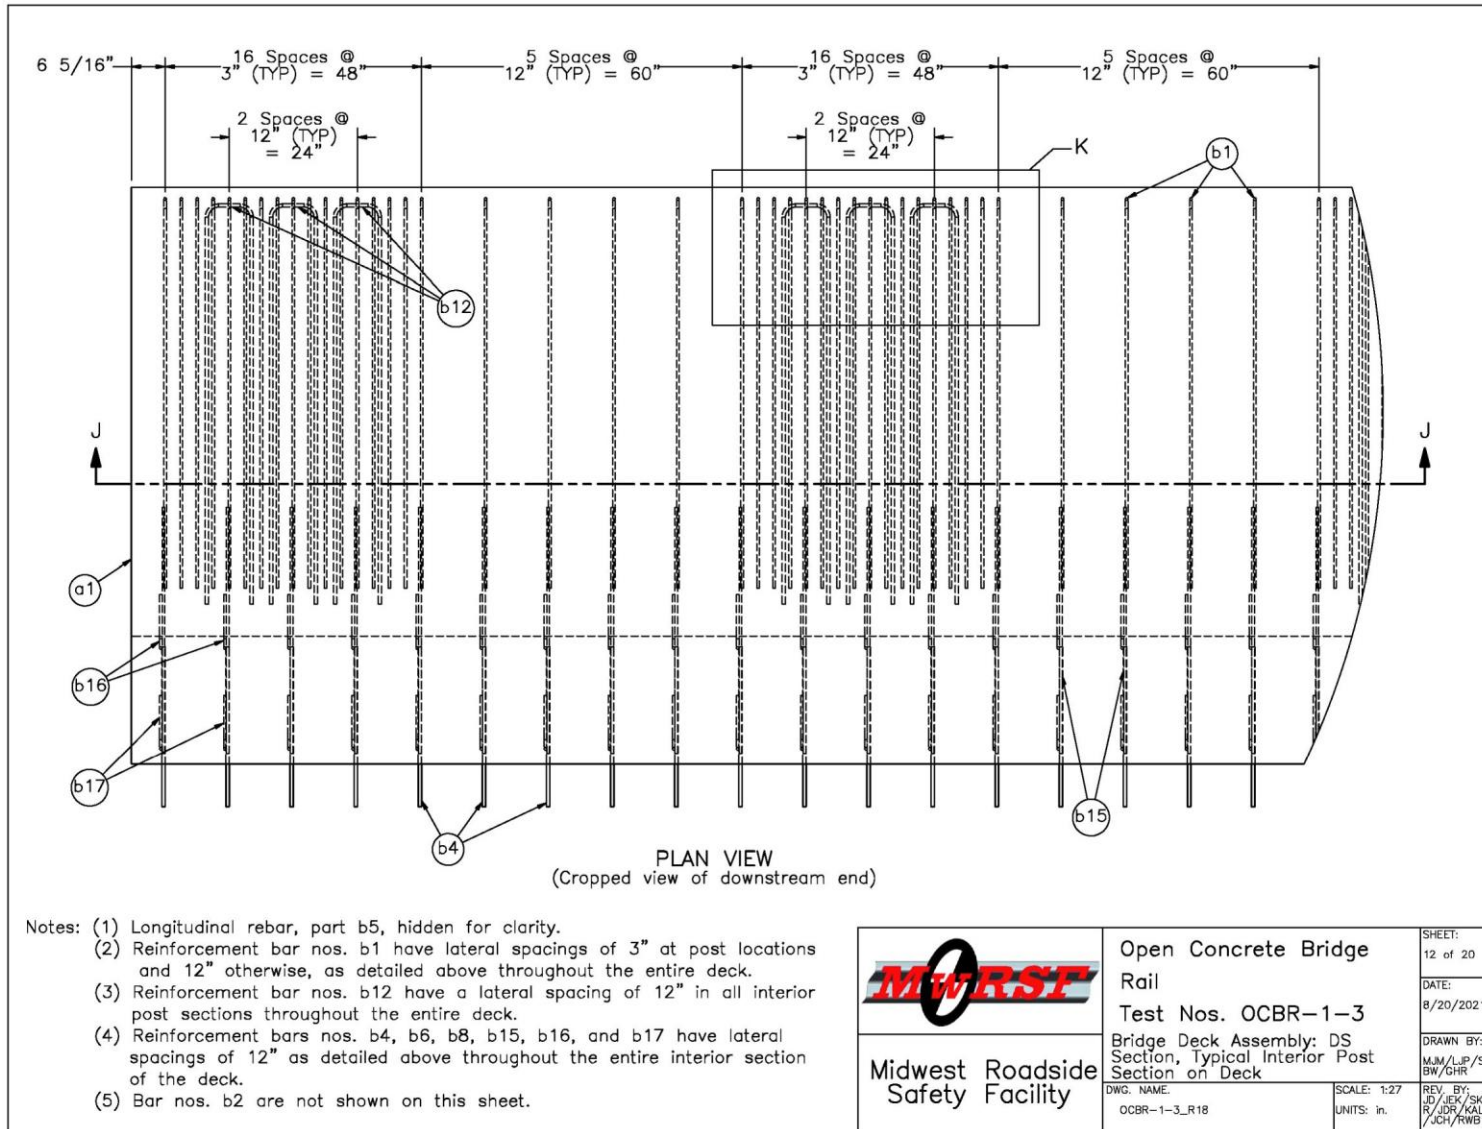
Bridge Deck Assembly: Downstream Section, Typical Interior Post Section on Deck, Test Nos. OCBR-1, OCBR-2, and OCBR-3
